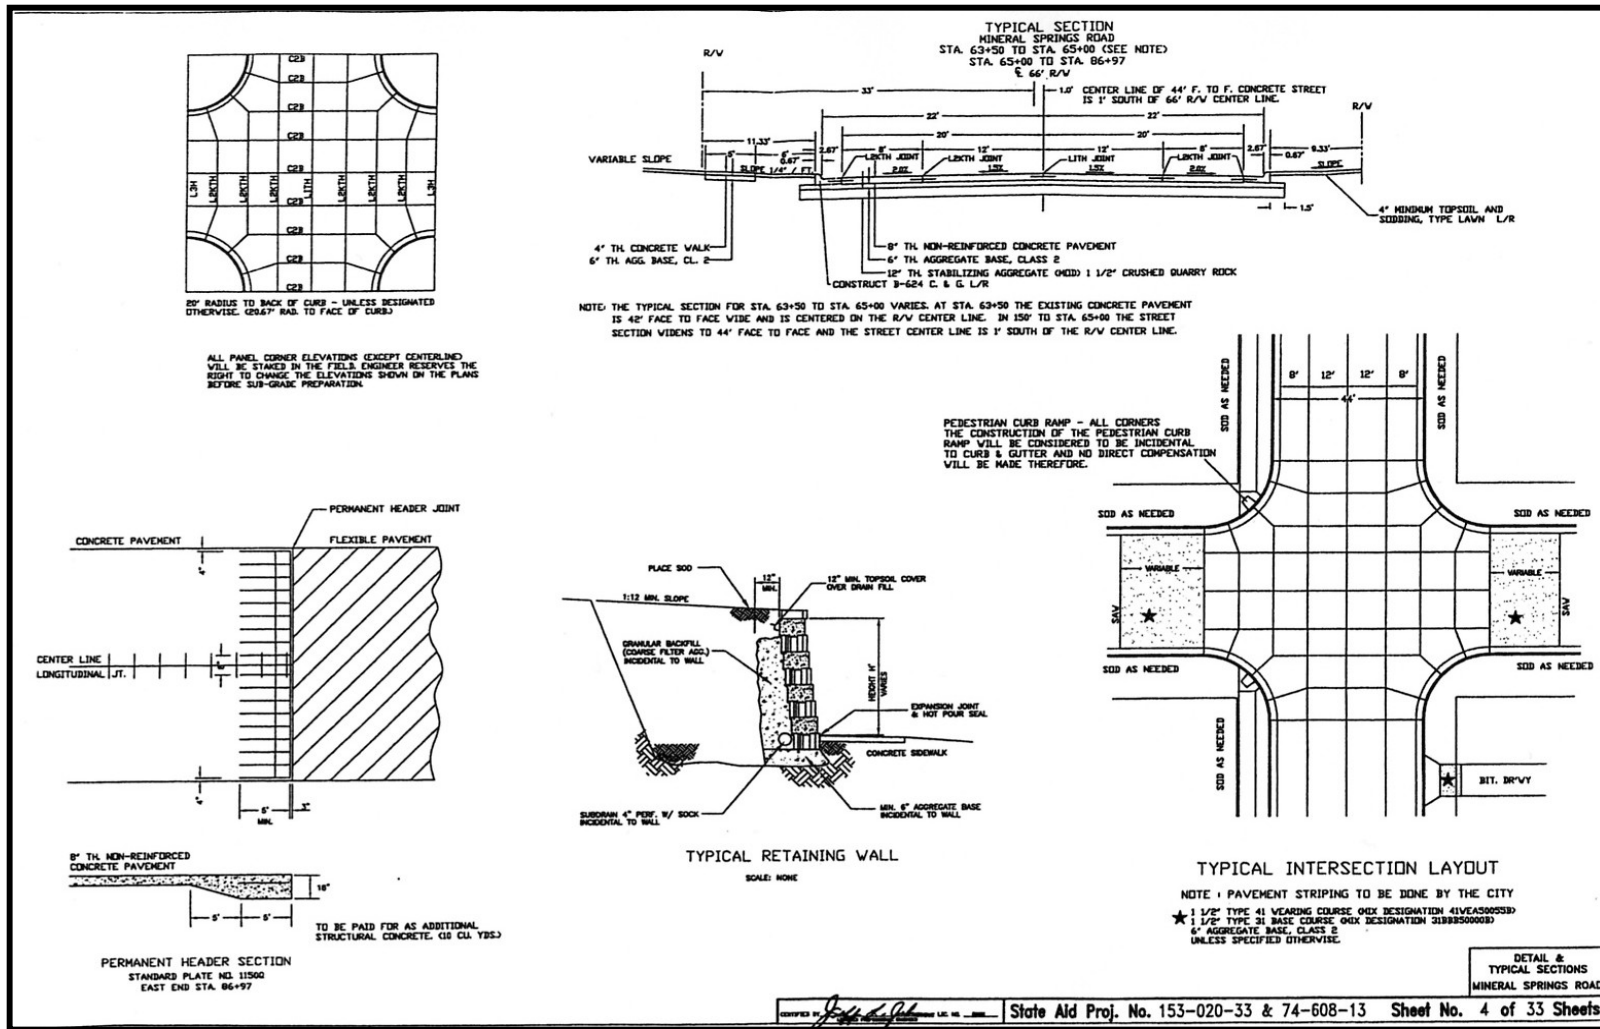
Typical PCC pavement construction plan for City of Owatonna.
